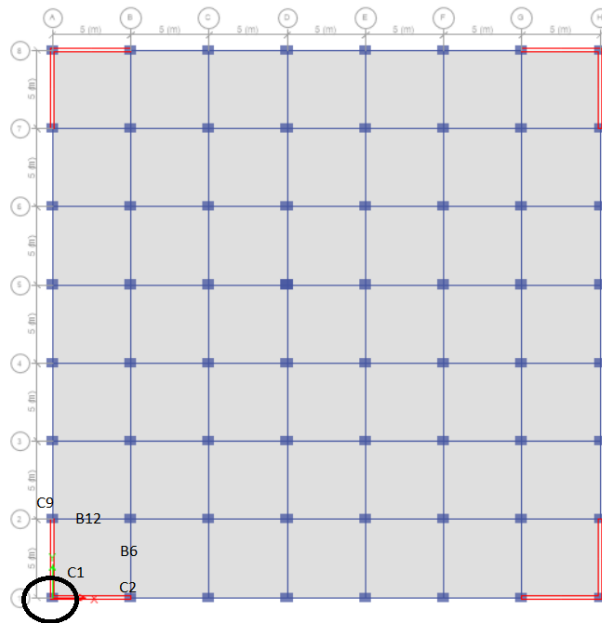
Location of columns C1, C2, C9 and Beams B6, B12
